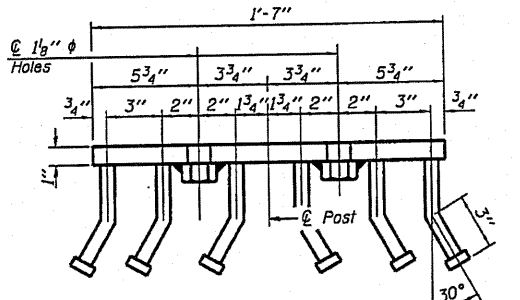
/4" Ø ROUND HEAD BOLT
